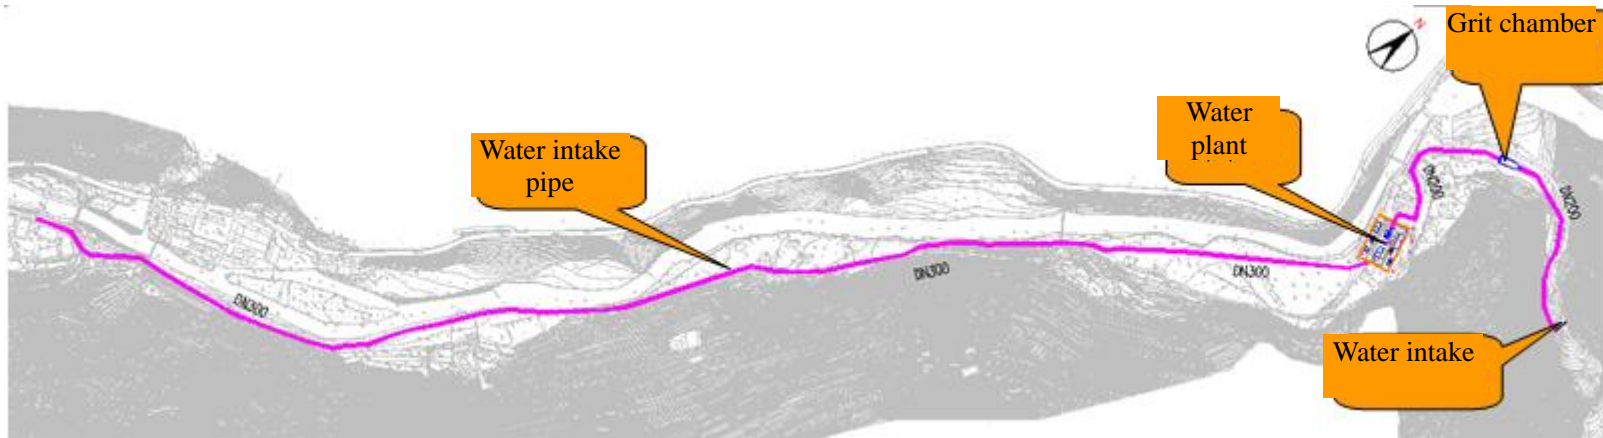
General layout plan of Lianghekou Water Plant in Baoxing County
